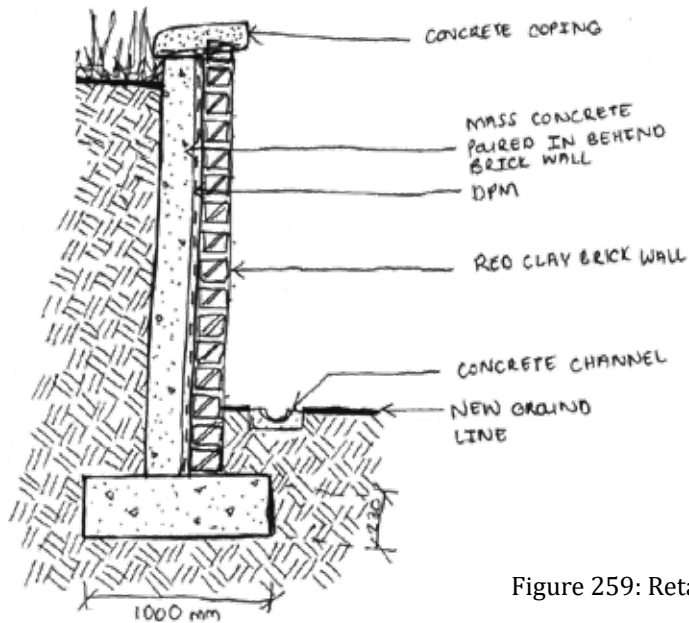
Retaining wall detail (Caldeira, 2019: drawing).
